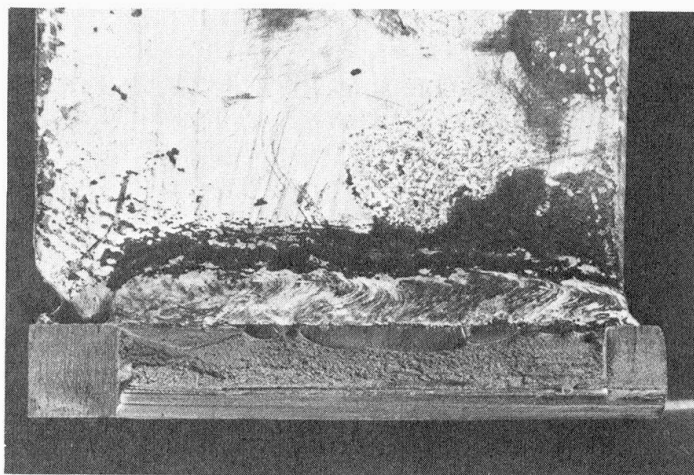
Multiple Fatigue Crack Growth at the Toe of Stiffener-to-Tension Flange Weld.
